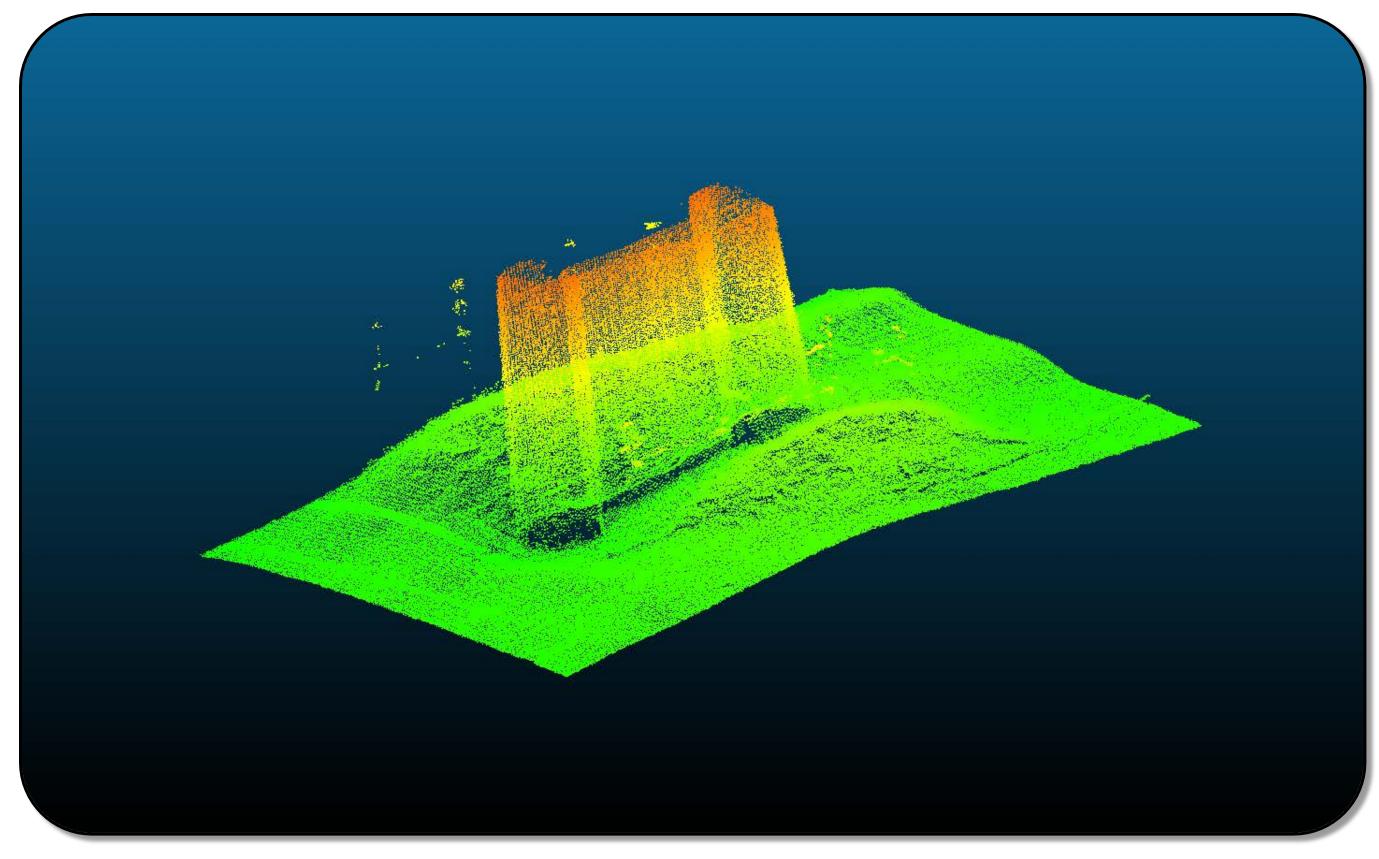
Perspective view of Pier 15 point cloud (looking from the northeast direction).
